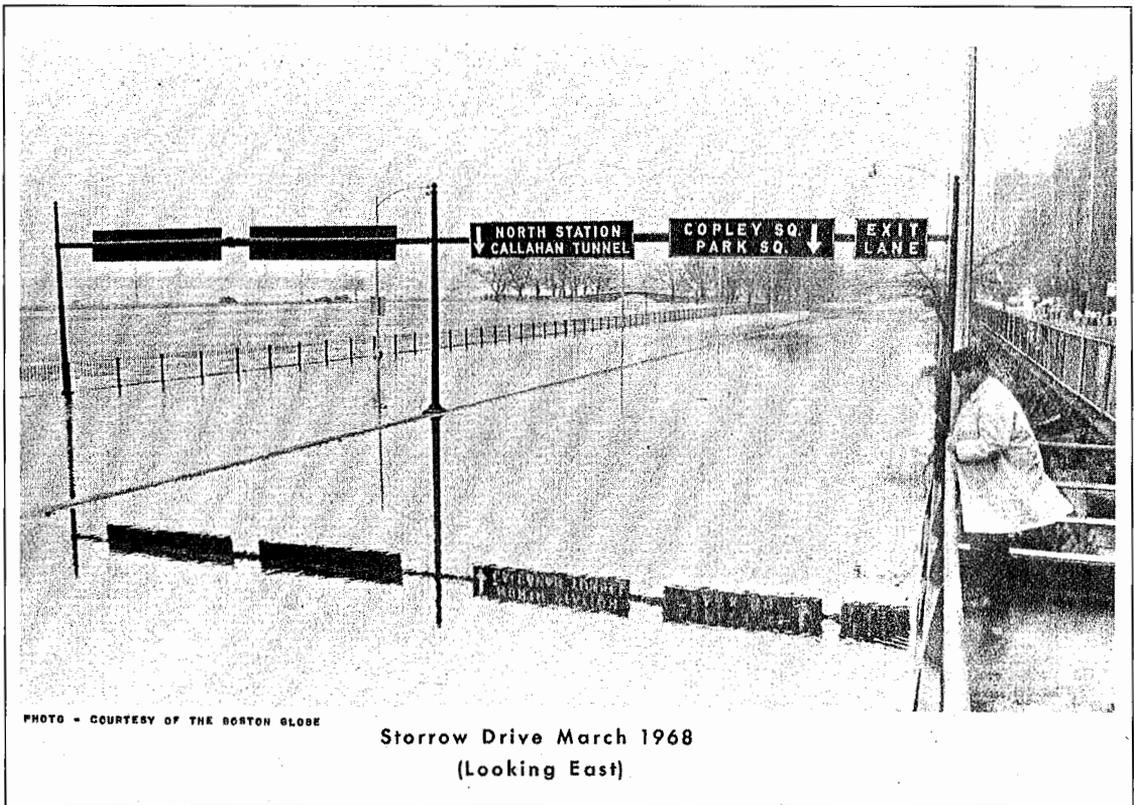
Flooded parkway near the tunnel in March 1968.
